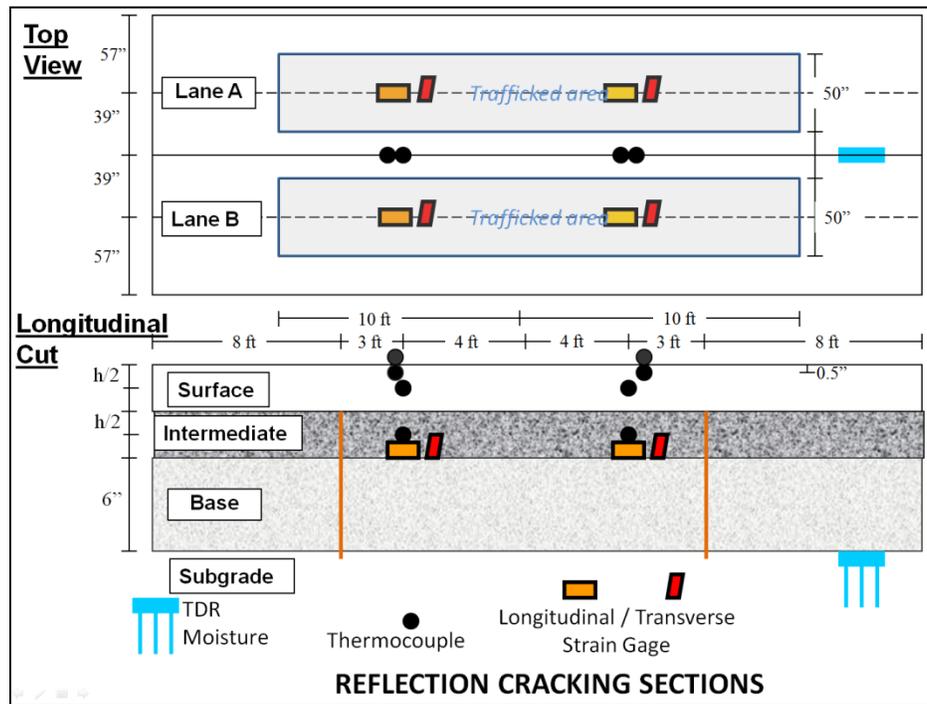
Instrumentation to Be Installed in the Reflection Cracking Sections.
